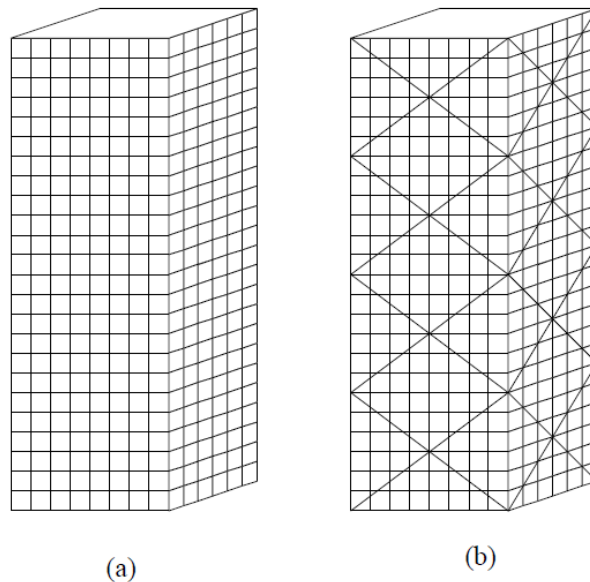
a) Structural framed tube b) exterior diagonalized tube.
